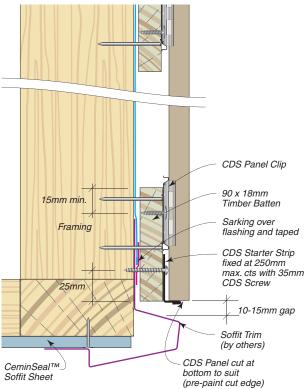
Soffit Detail - With Soffit Trim - Elevation
